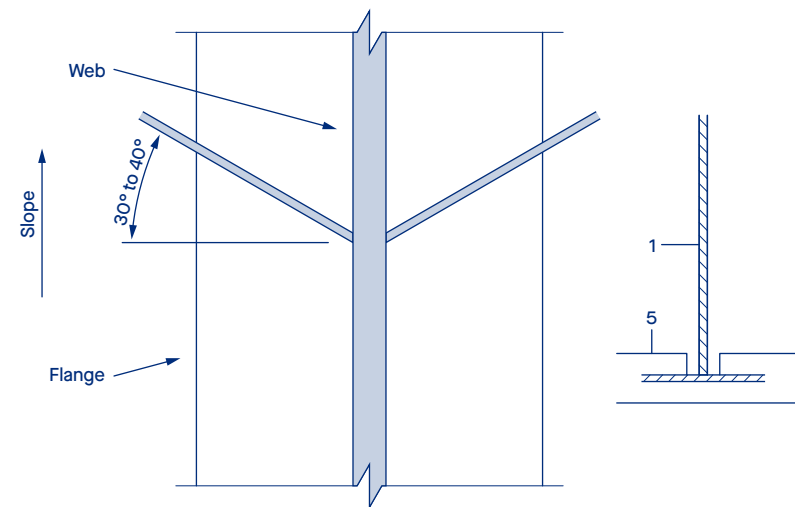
Drip plate attached to bottom flange, sloped to prevent debris accumulation. Sloped abutment platform and drain
